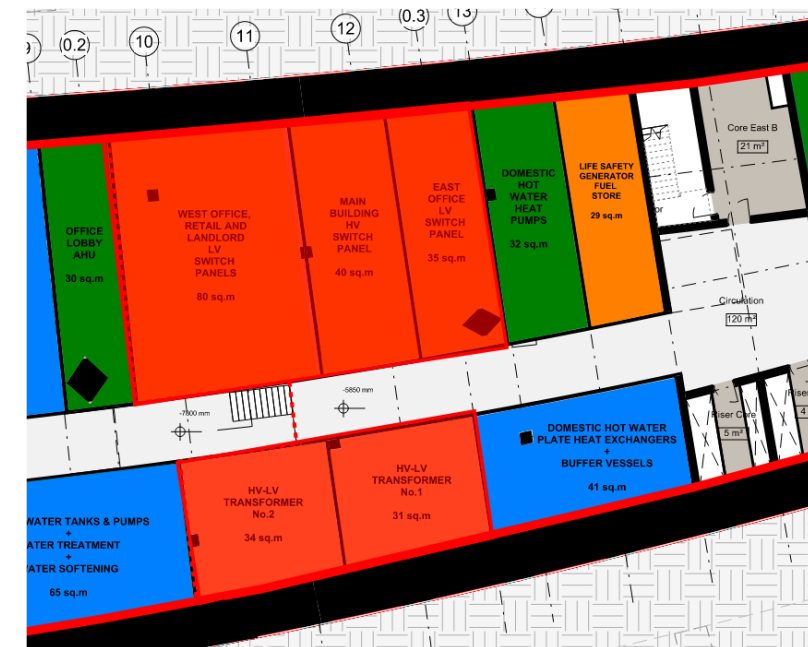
LV switch Panels and HV-LV Transformers rooms at Basement level
